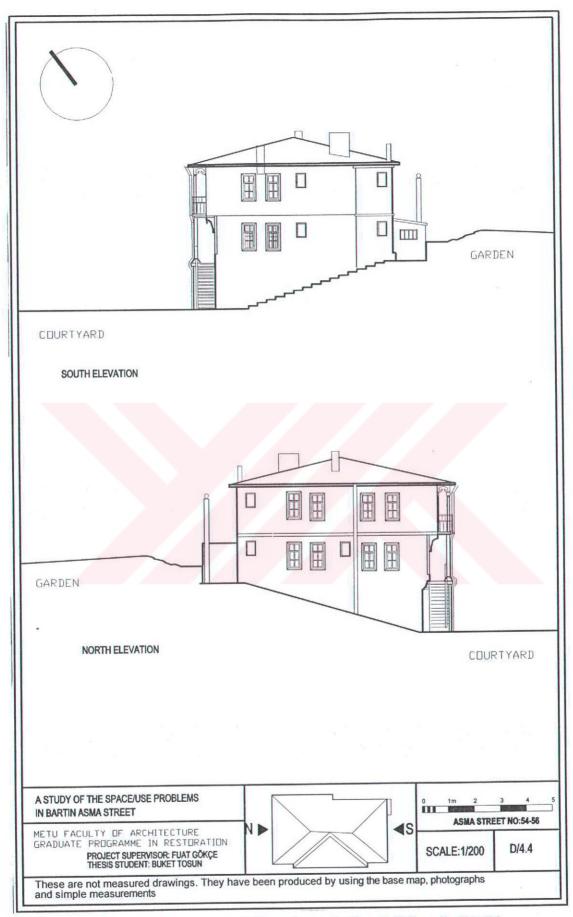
Sketch Drawings of Facades of the Building No:54-56
